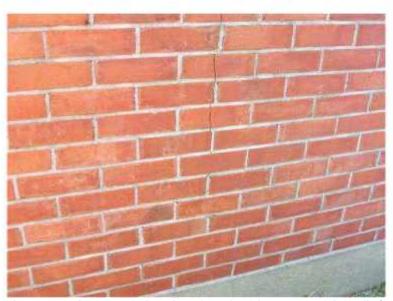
Moderate Vertical Cracking through Brick Veneer at Right Wall of Flat 7 (Photo 1 of 5) Looking Southeast
